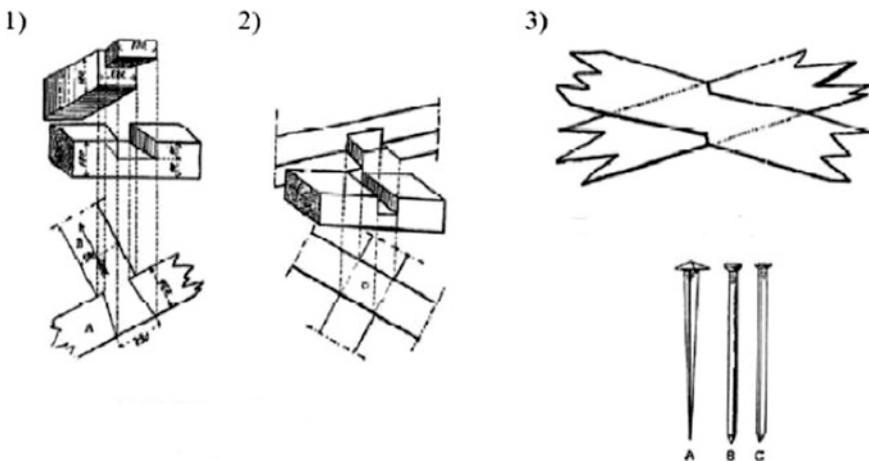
Connections between wood bars of the *Gaiola* [4]
